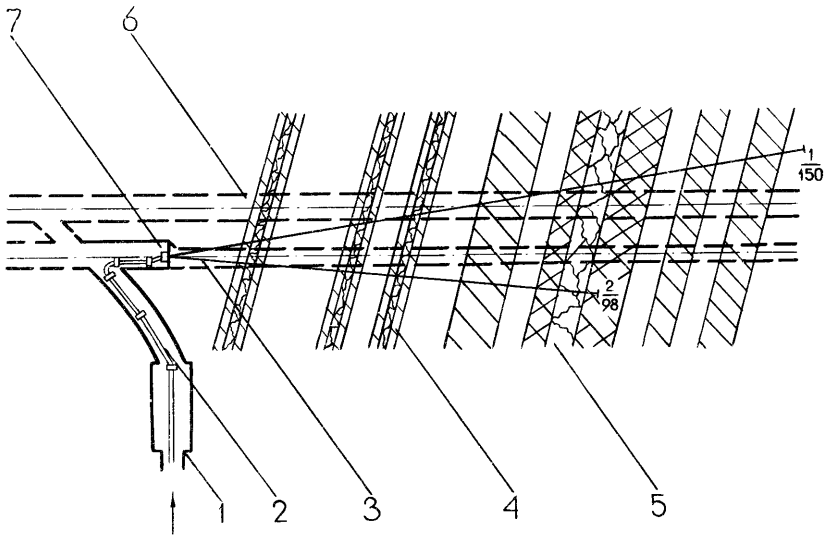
Advanced grouting scheme of tectonic rupture zones in tunnel and gallery driving
